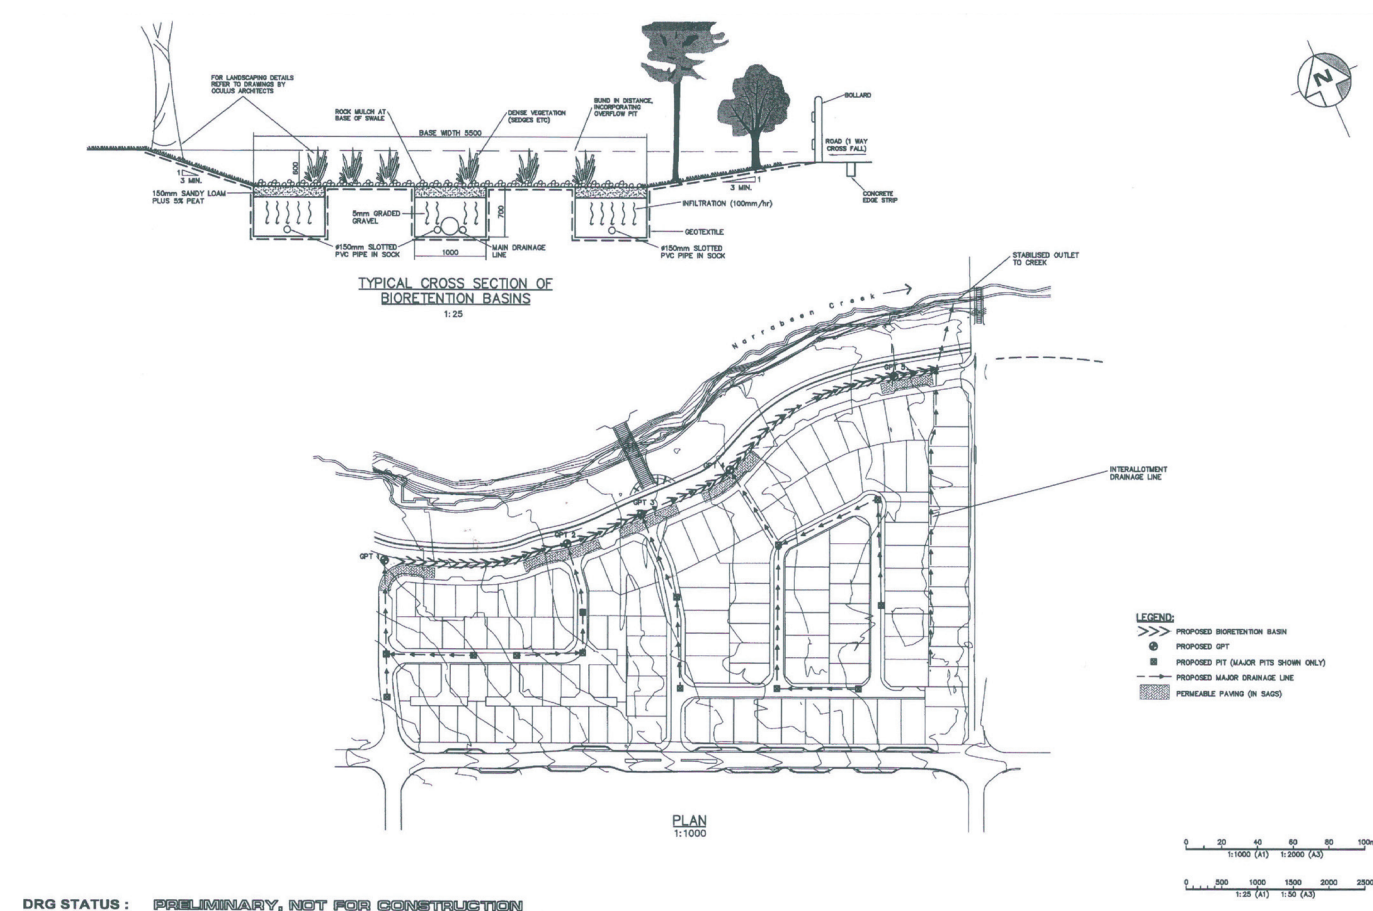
Stormwater Drainage Concept Plan (SDCP)
